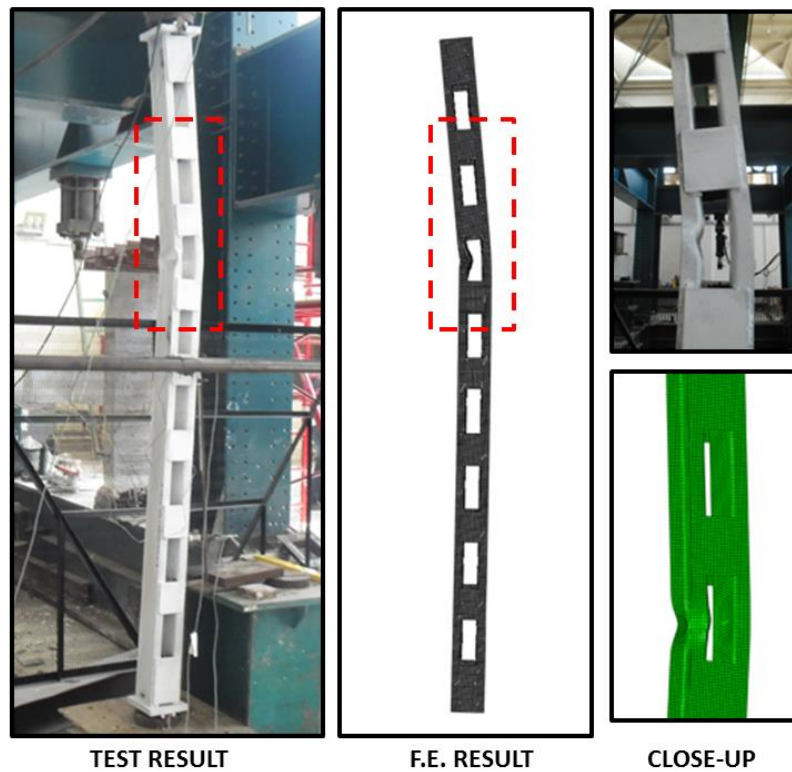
Deformed shape of built-up CFS battened column B2B50-150
